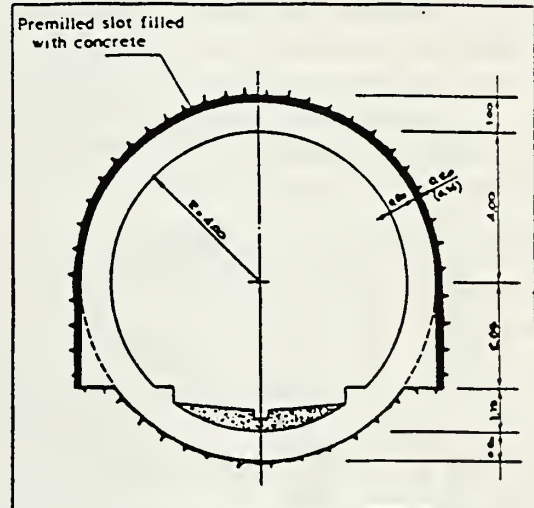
Geometry of Roggiano Railway Tunnel, Italy, showing premilled protective arch.
